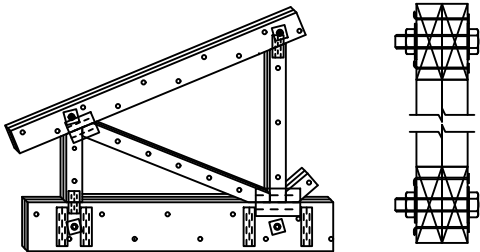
DETAIL TO BE USED WHEN HOOP IRON IS FURTHER THAN 200mm FROM TRUSS
